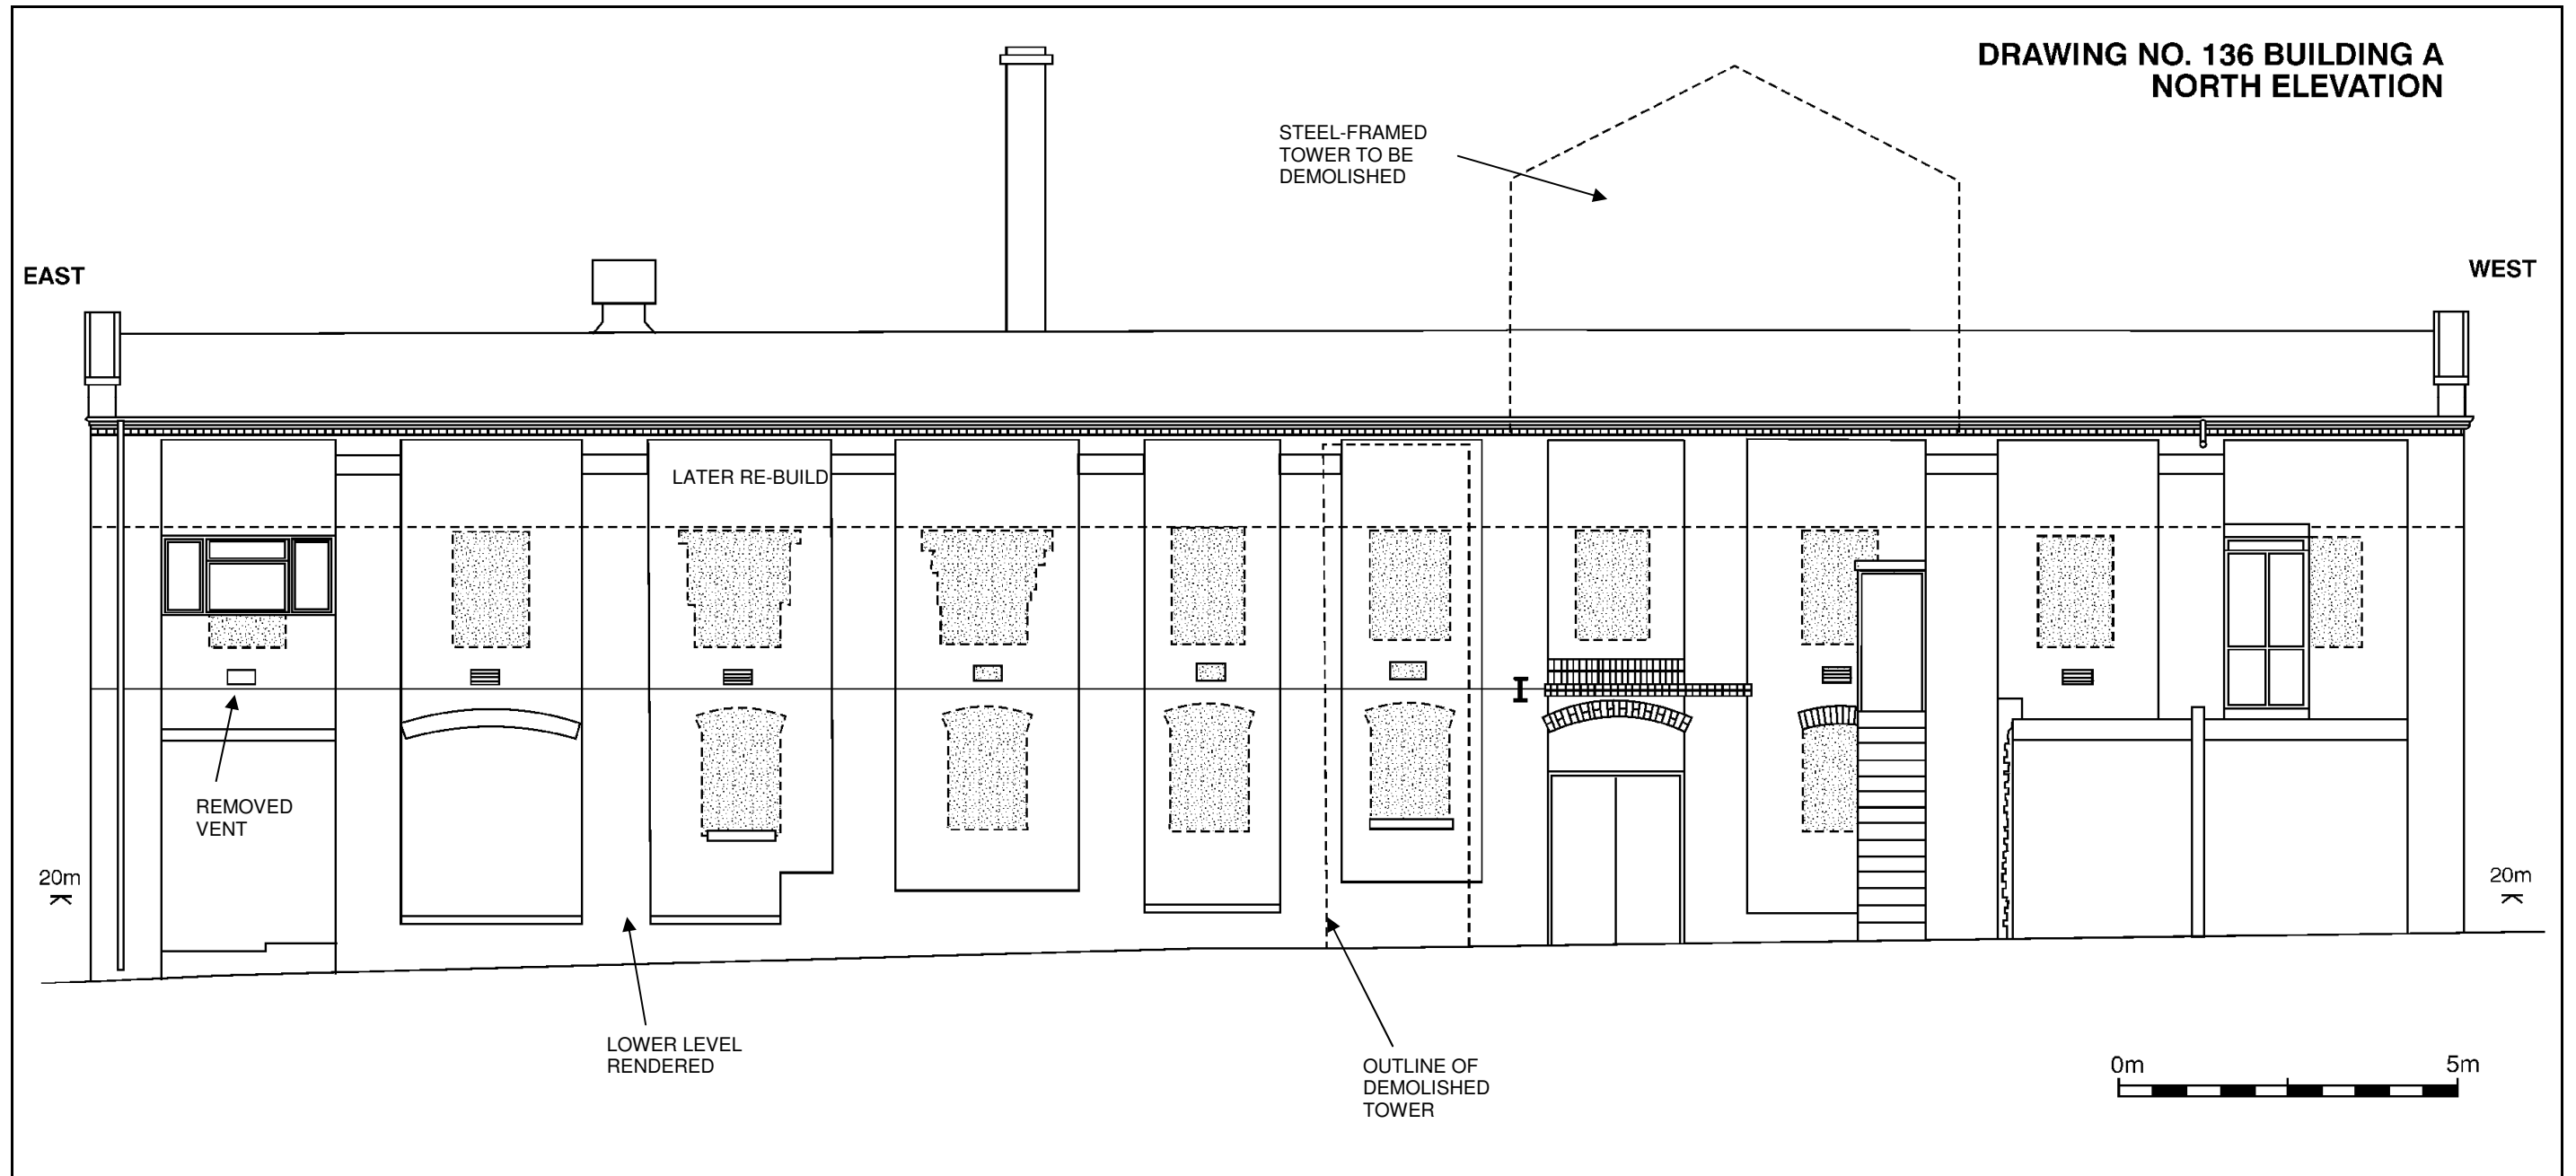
Survey drawing of the north elevation of Building A (scale 1:100)
